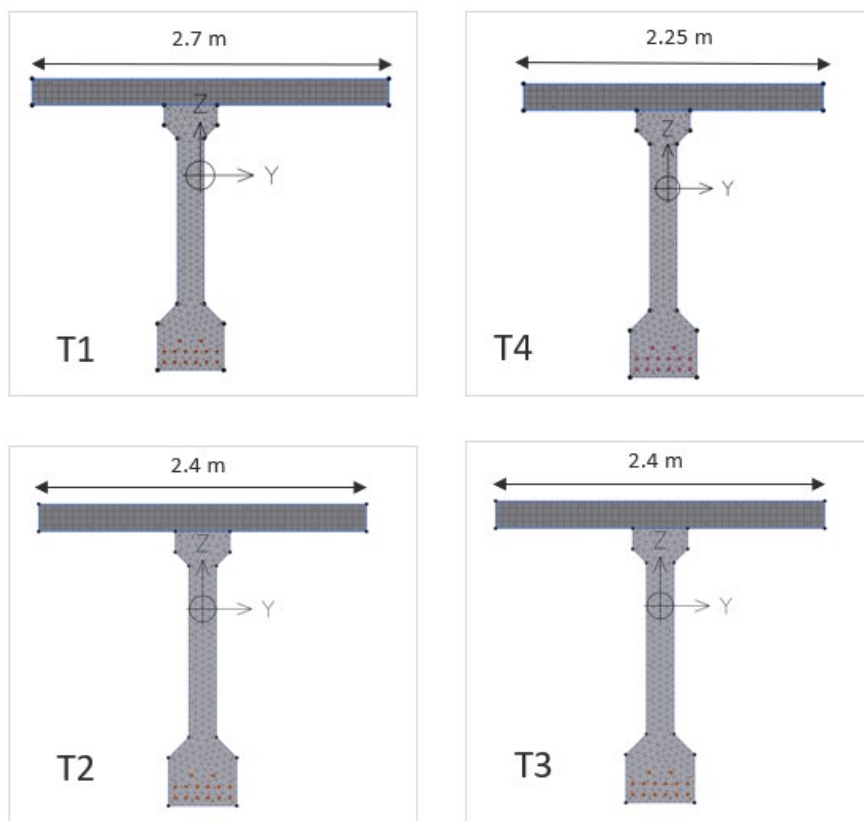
Cross-sections of fiber beam element at the midspan of each girder.
